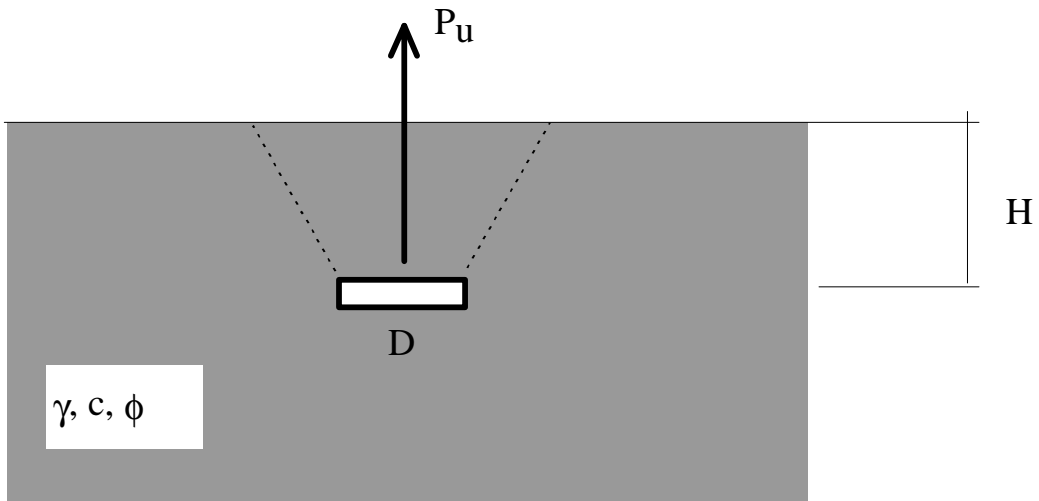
Uplift of Cylindrical Anchor Plates.
